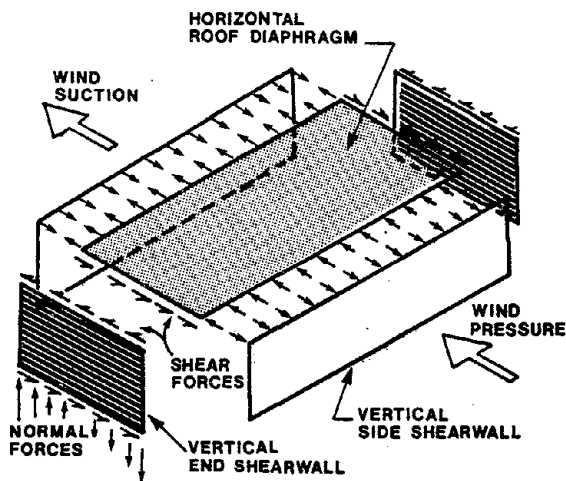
Shearwall and Diaphragm Action in a Simple Box-Type Building
